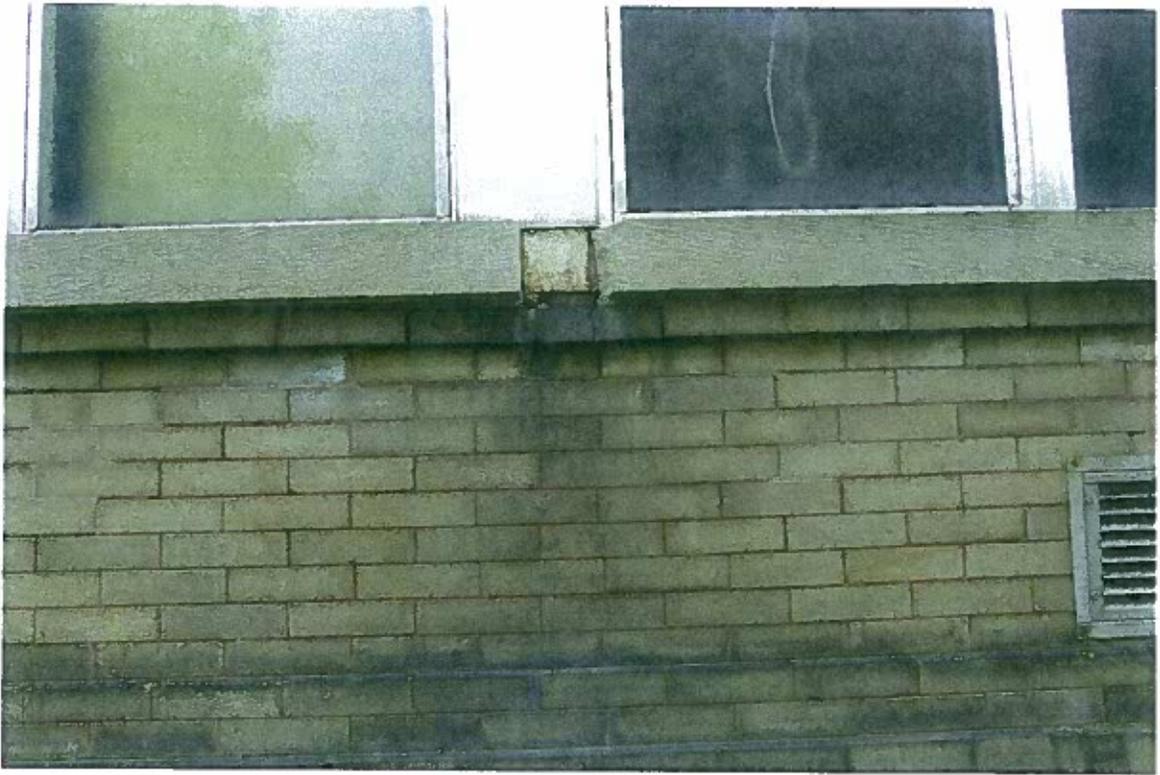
Missing section of Indiana limestone sill at a stress crack.
